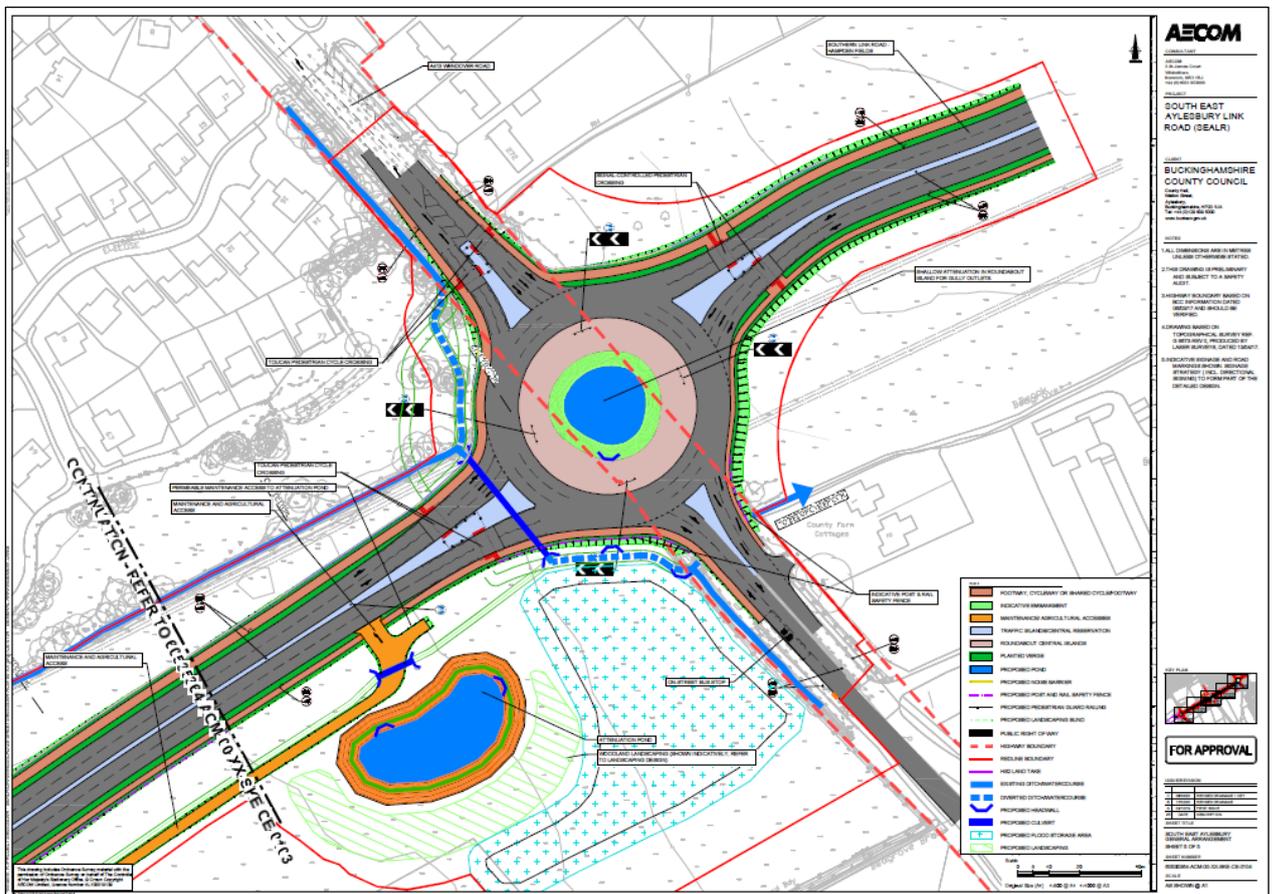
A413 Wendover Road / SLR / SEALR Roundabout Layout
